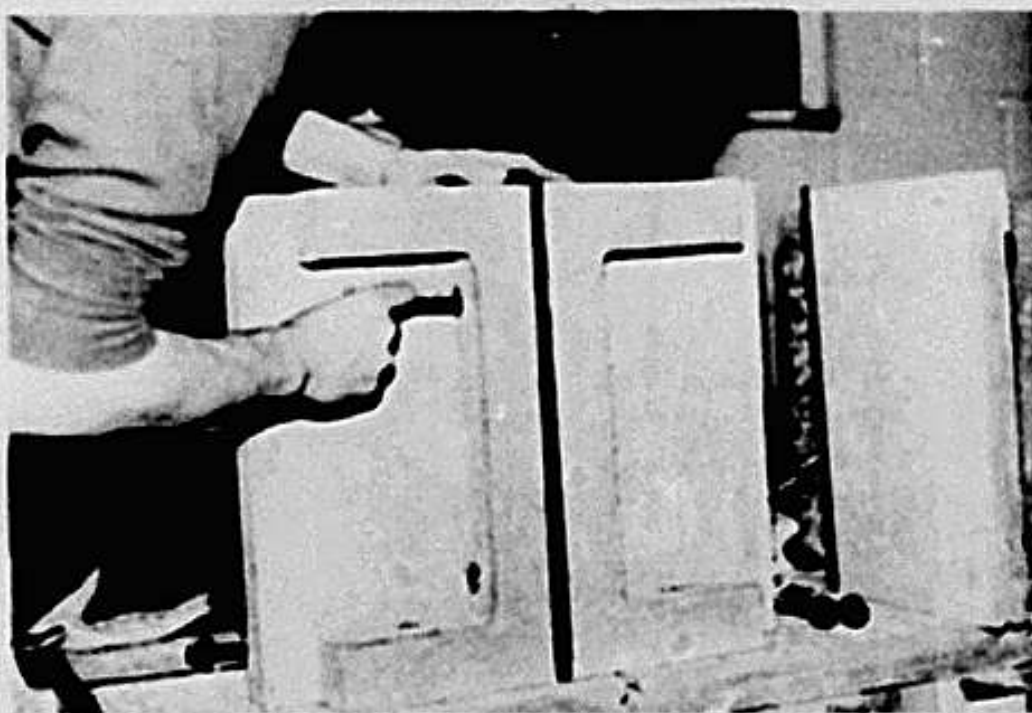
BOLTING THE TEST SPECIMENS TOGETHER TO FORM A LONGITUDINAL JOINT
